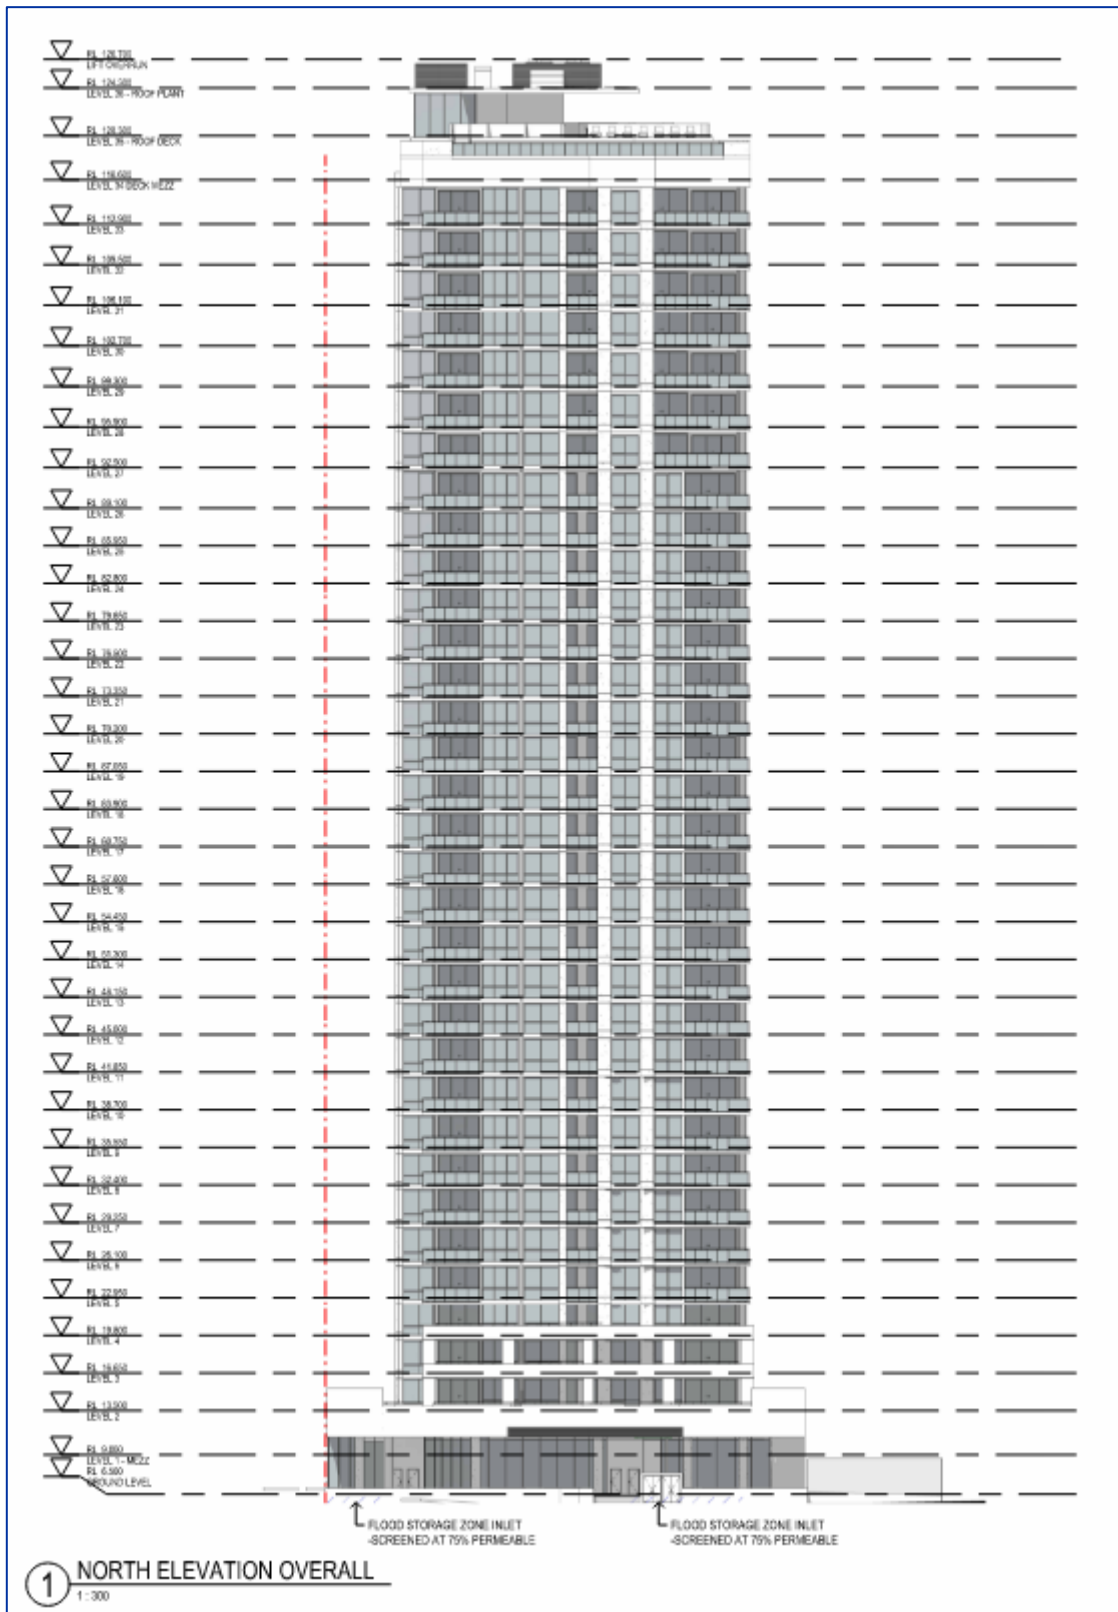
North Elevation of West Tower facing Stanley St, Woolloongabba
